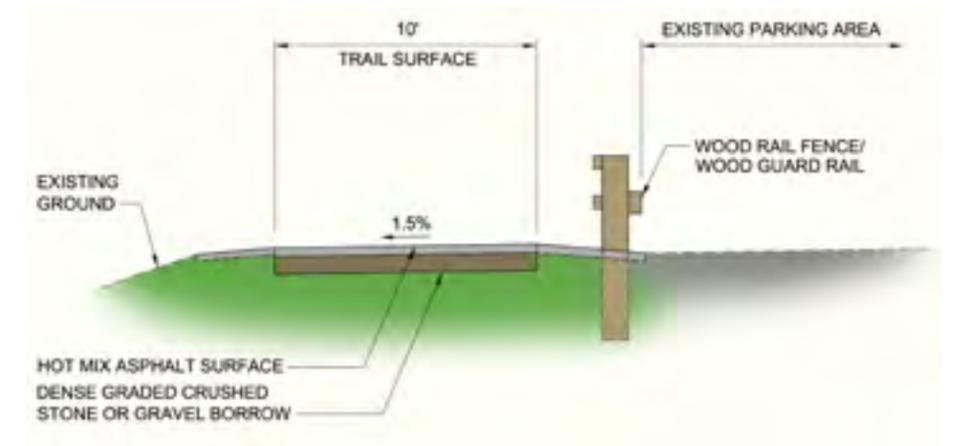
SECTION B-B: TYPICAL TRAIL ADJACENT TO PARKING FACILITY
